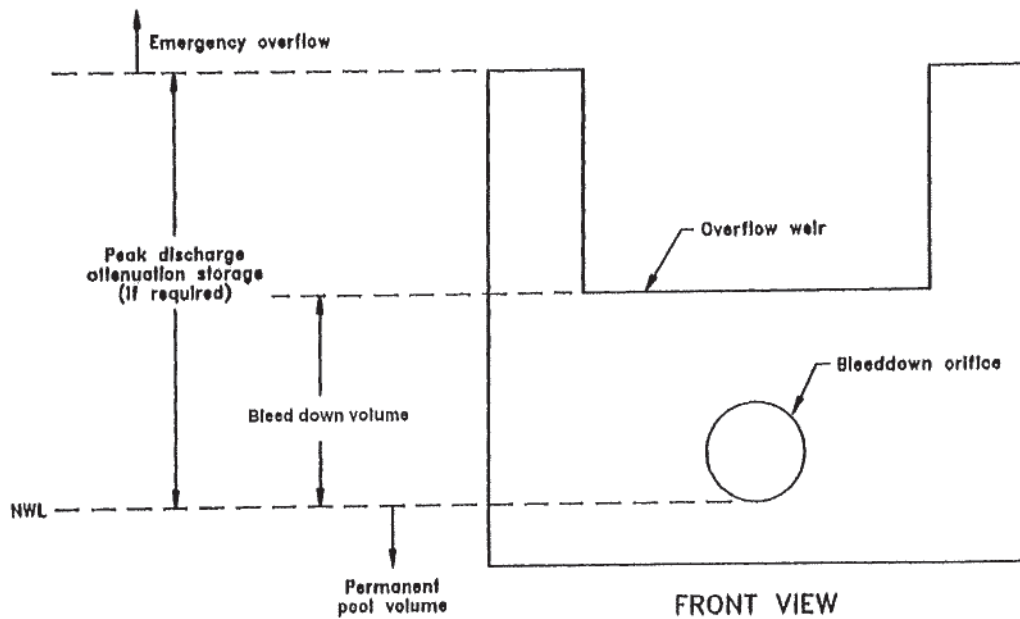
Typical Wet Detention Outfall Structure (N.T.S.)
